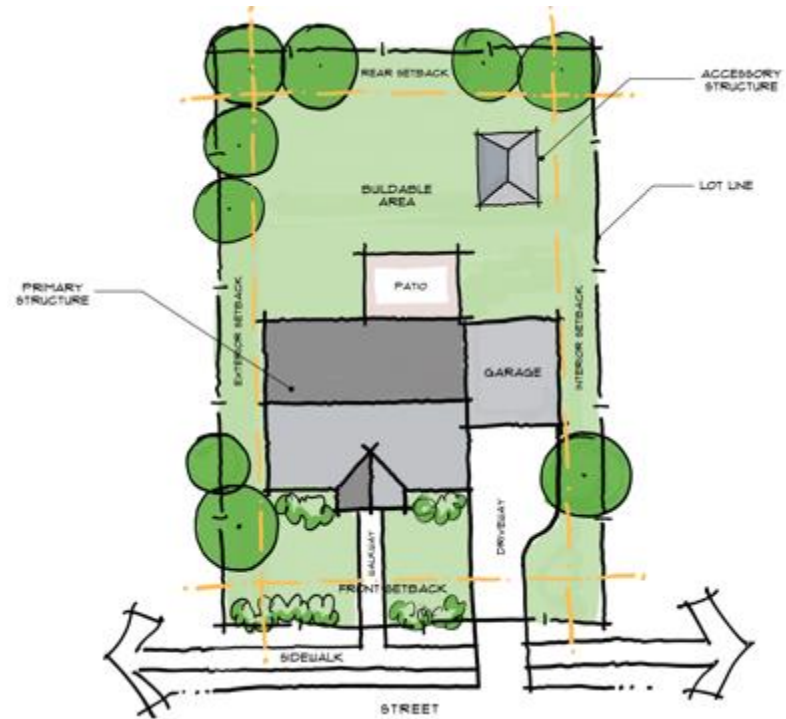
BUILDING PLACEMENT WITH ACCESSORY STRUCTURE
